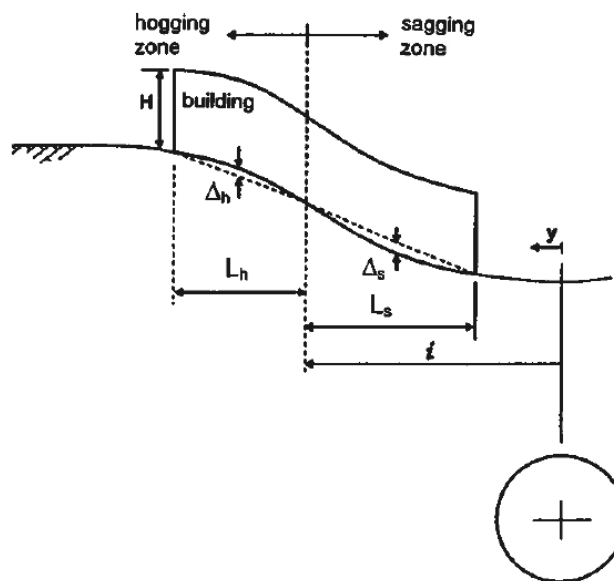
Deformations of the building above a tunnel (Mair et al, 1996)
